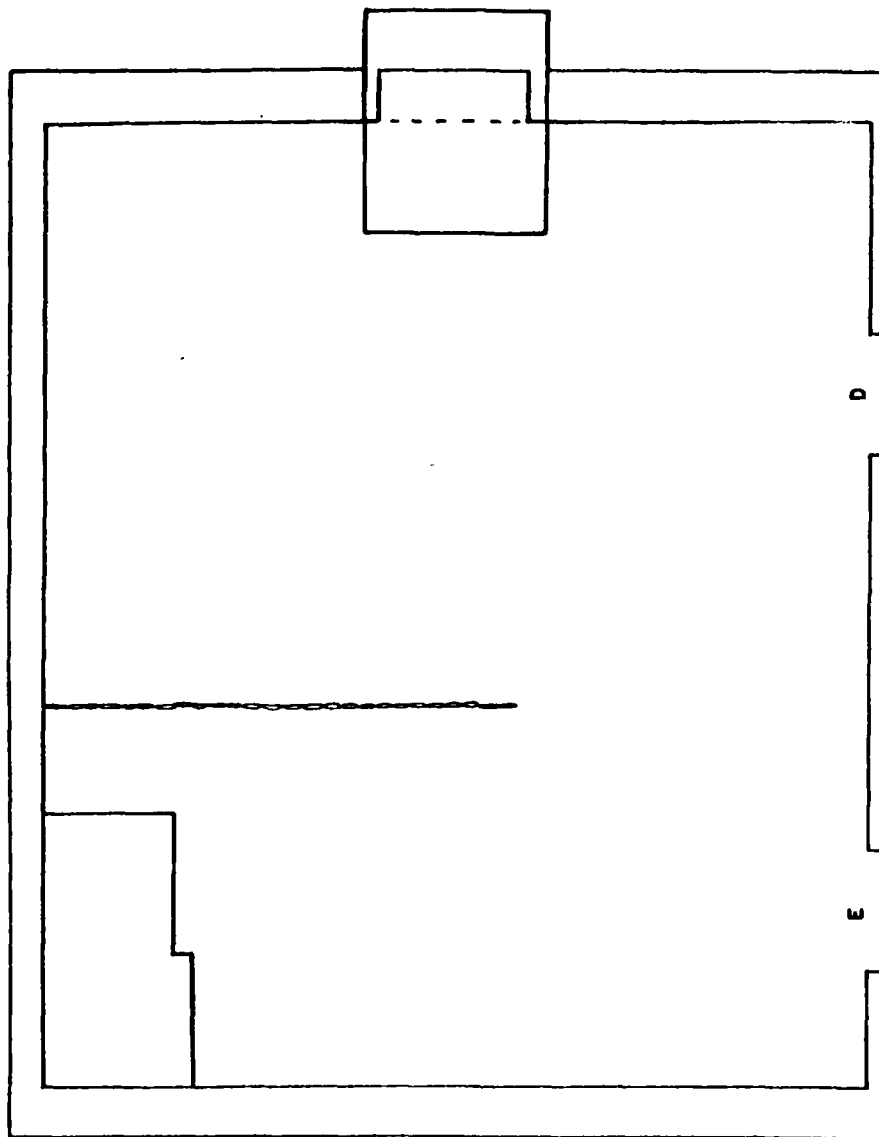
Floor plan of Rooms 1 and 2, dwelling on Tract 239.
